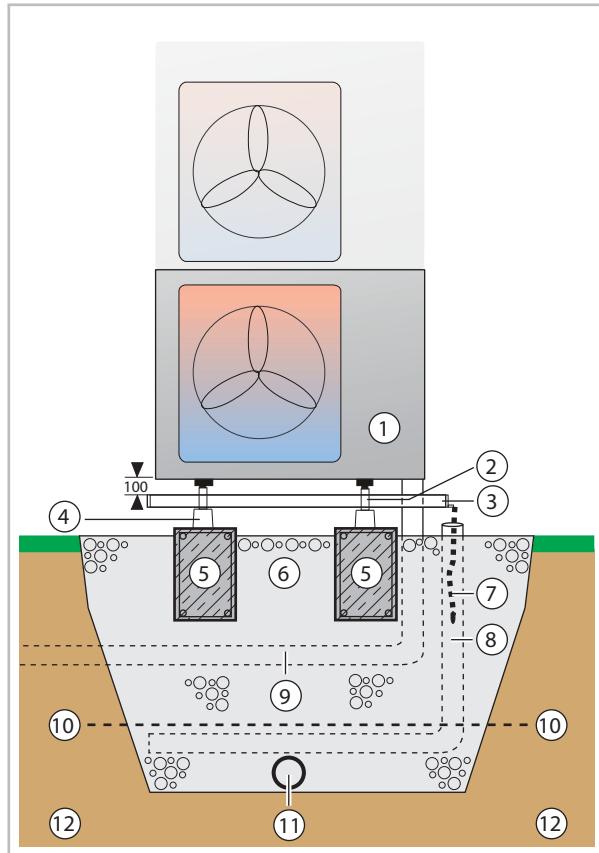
Condensate drainage, seepage of condensate and strip foundation based on MVV 1200-1600 DC as an example (cross-section)
